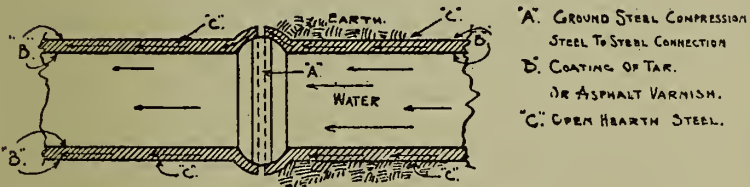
FIG. I. SECTION OF OPEN HEARTH STEEL PIPE
